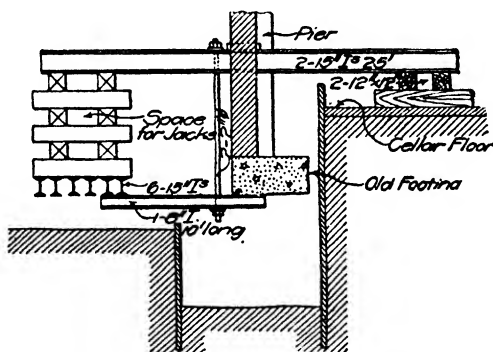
Suspended Support for Footing, Silversmith's Building, New York.
